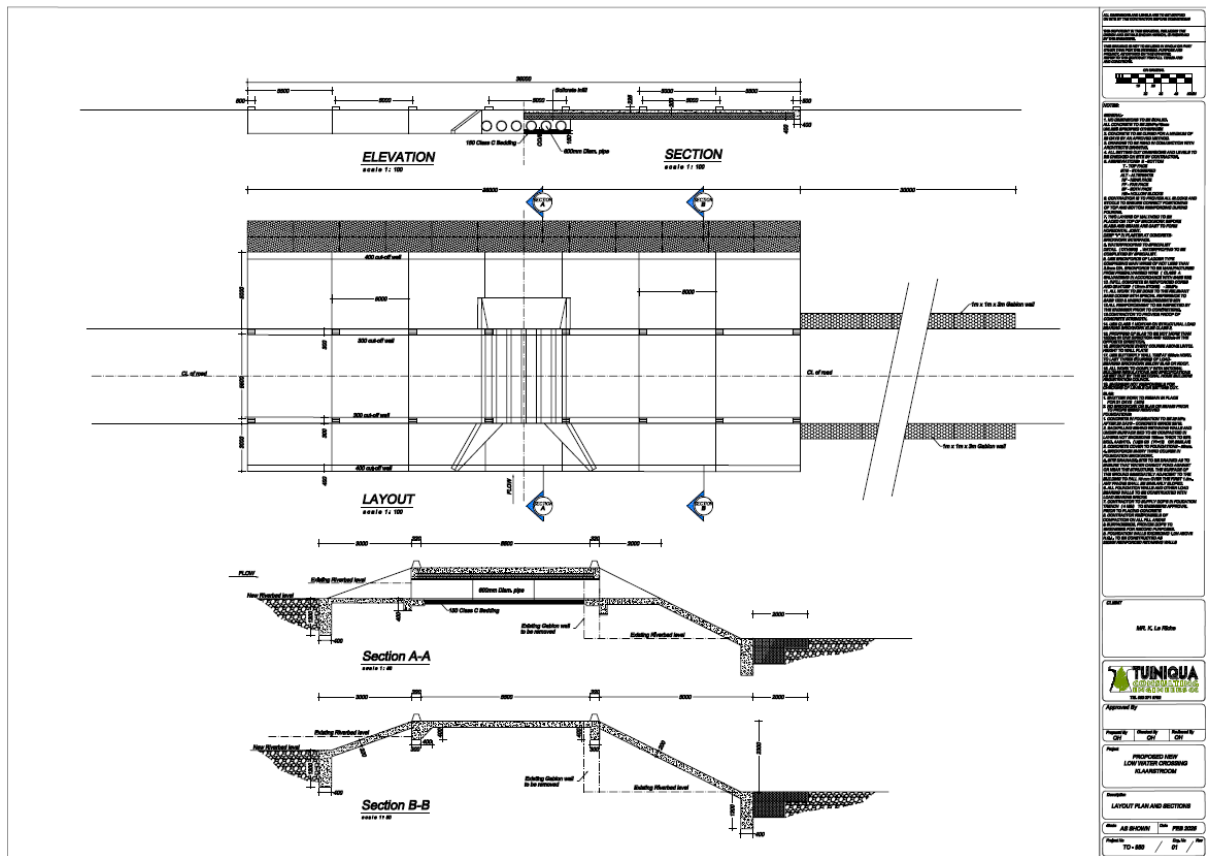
Original proposed design for the upgraded access road crossing over the Jan Rolms River (Tuiniqua Consulting Engineers).
